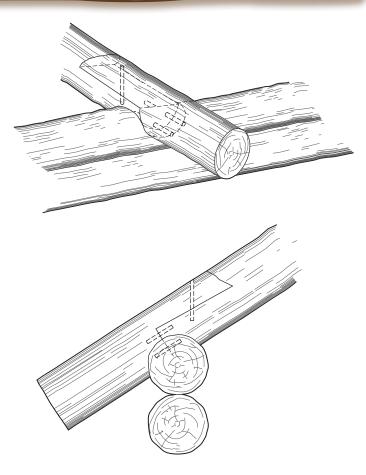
This drawing shows a modified butt scarf rafter tail joint. Hidden dowels join the two pieces horizontally and an exposed dowel joins them vertically. You cover the exposed dowel when you replace the roofing.
